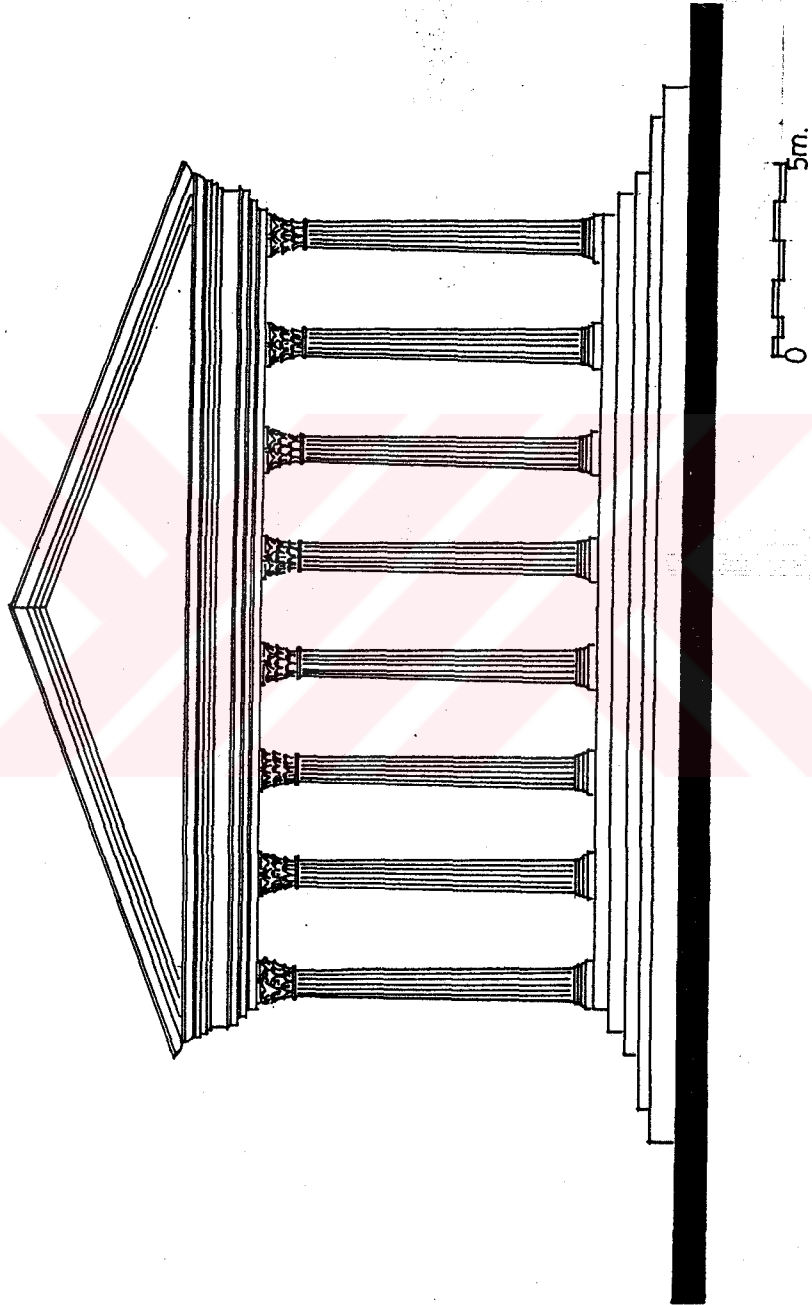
68. Facade ( Restitution Proposal for the South Facade )
